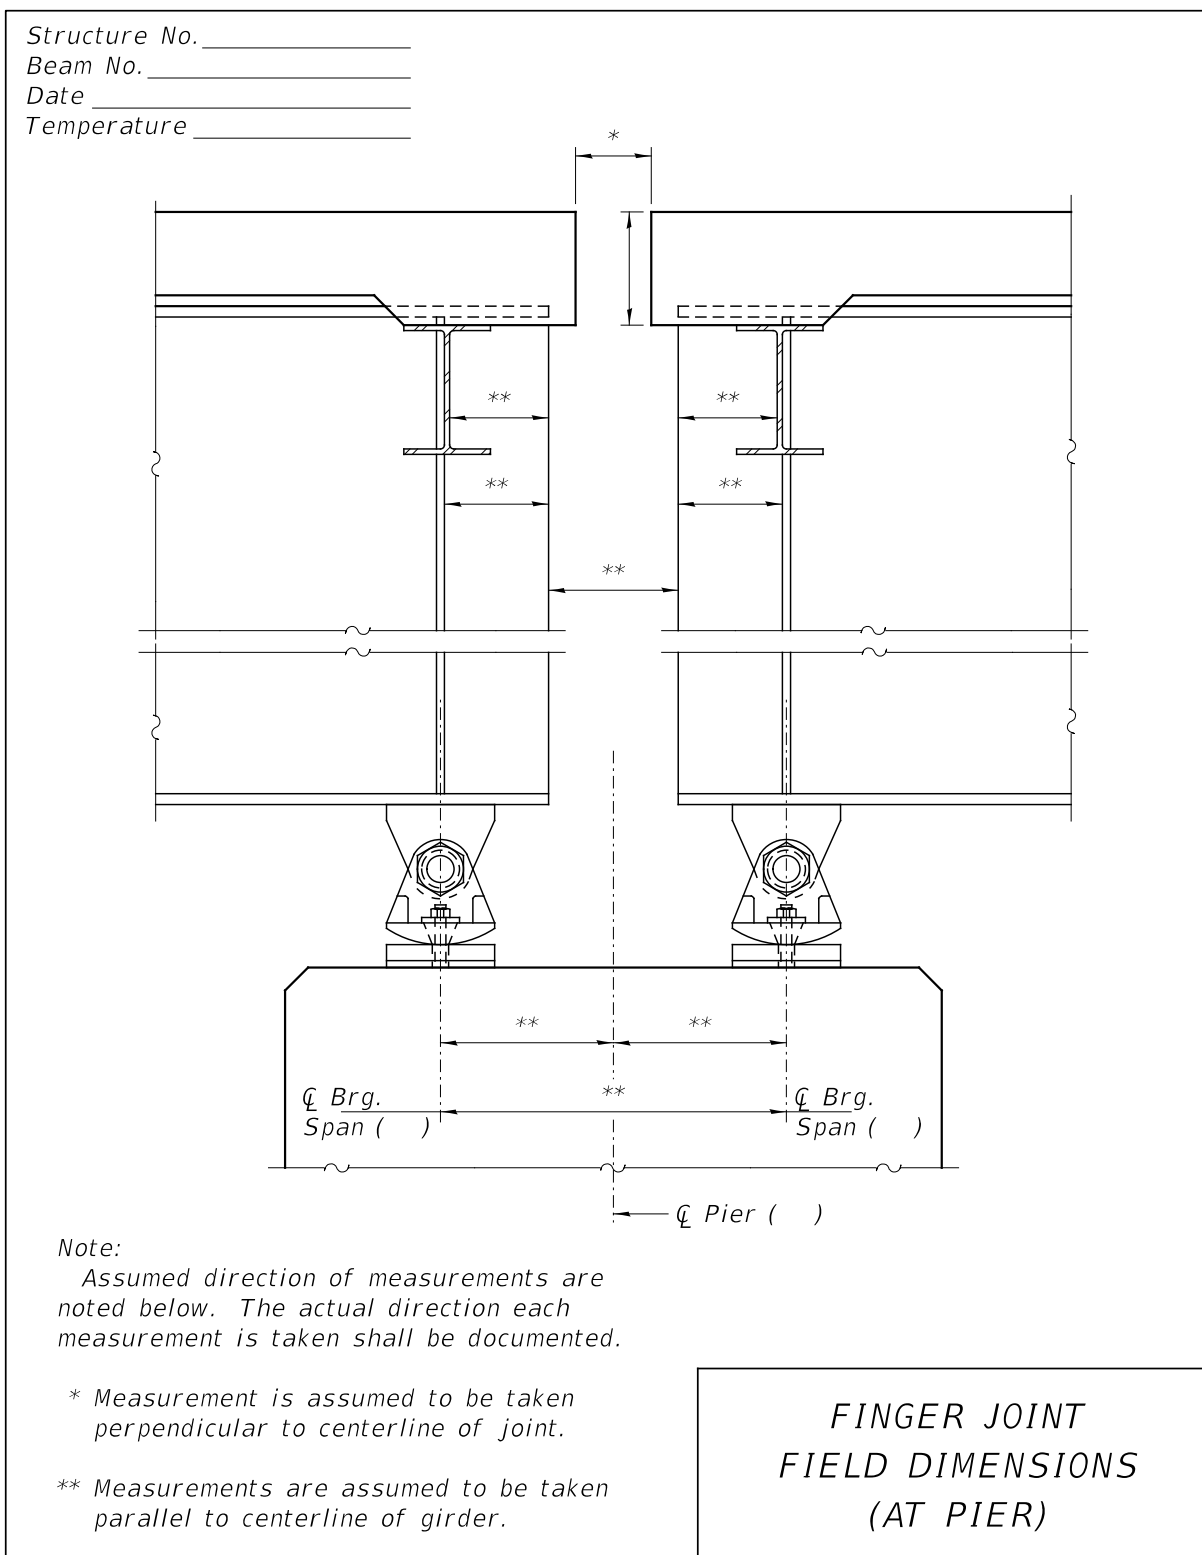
Finger Joint Field Dimensions (At Pier)
